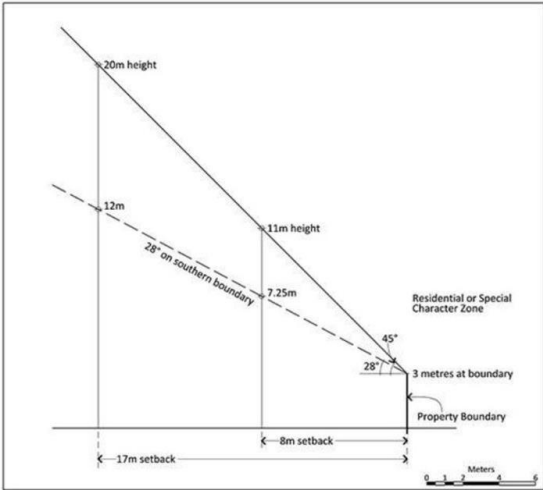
Building envelope for buildings located on an Arterial Transport Corridor
